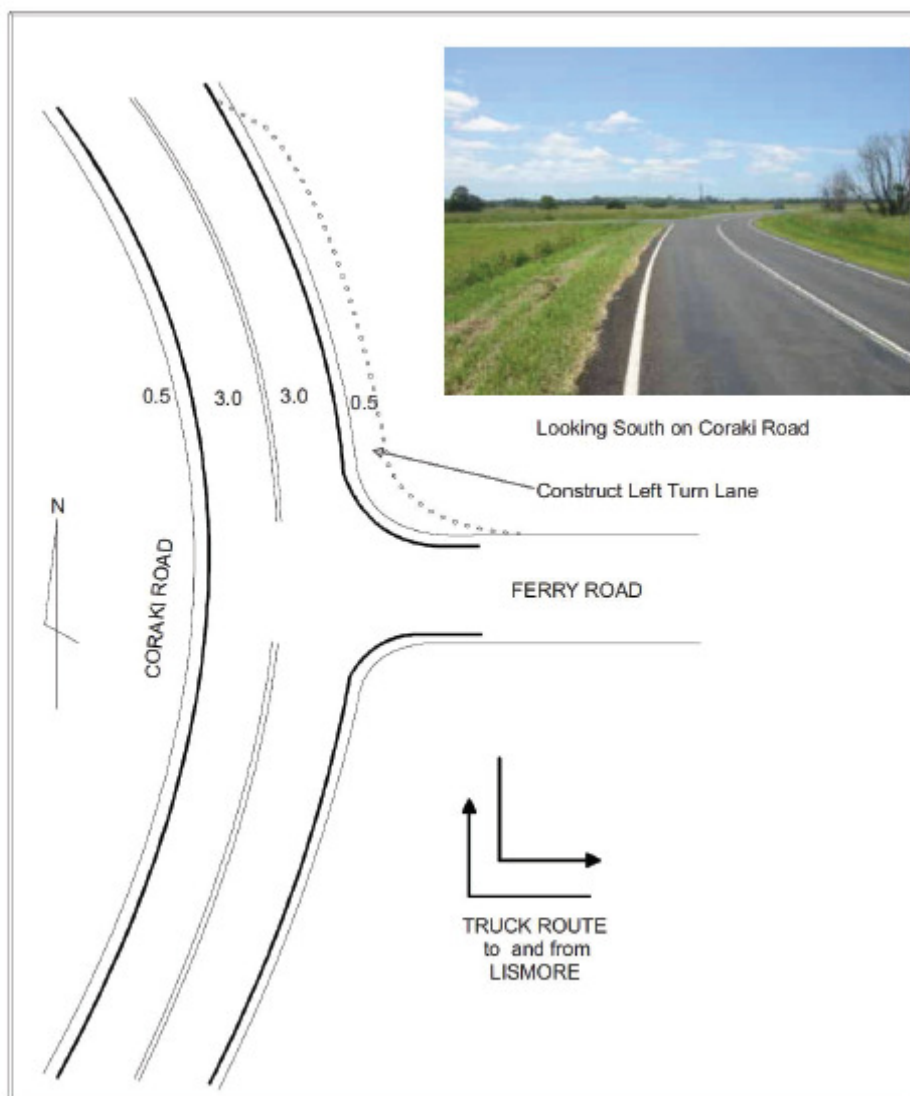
Coraki Road / Wyrallah Ferry Road Intersection Upgrade
